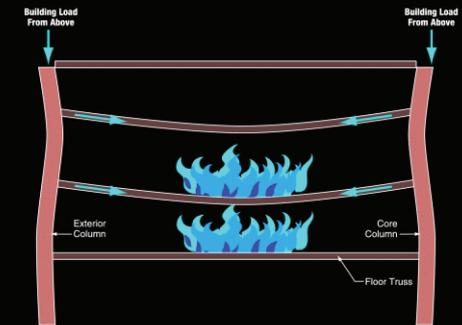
Catenary action of floor framing on several floors initiates column buckling failures.
